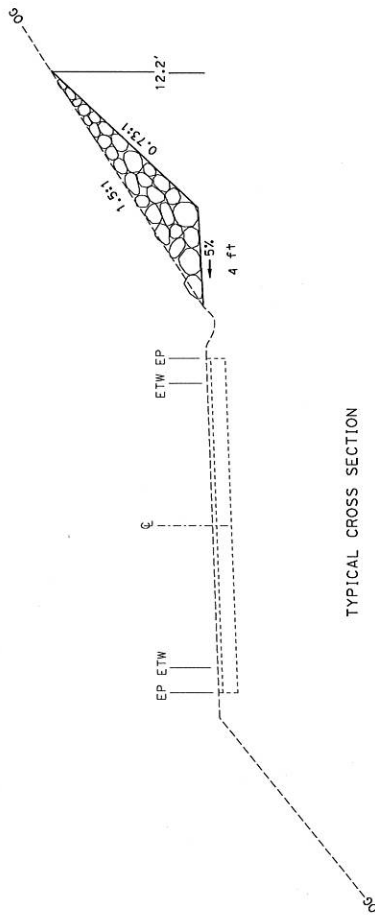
Typical section of proposed RSP at Location 1 between Station 113+60 and Station 113+85.
